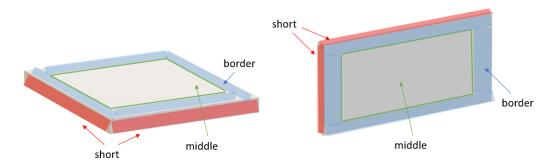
Connection zones in a slab (left) and a wall (right): short, middle and border
